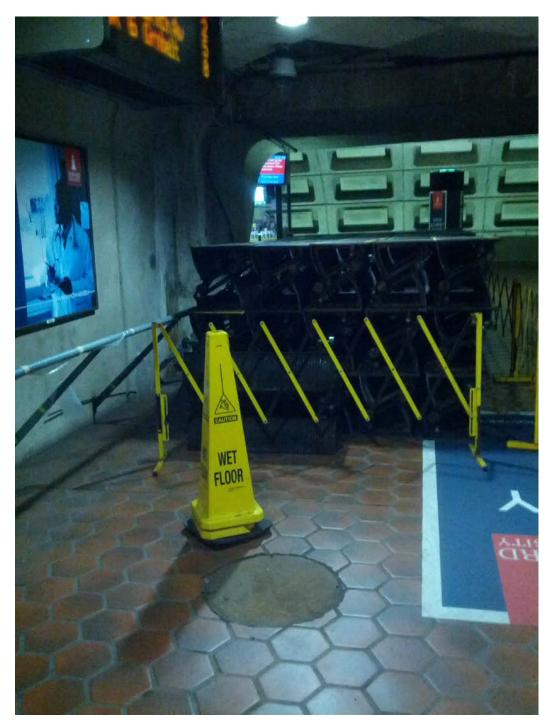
E02 Shaw-Howard U (North) – Handhole in mezzanine floor
